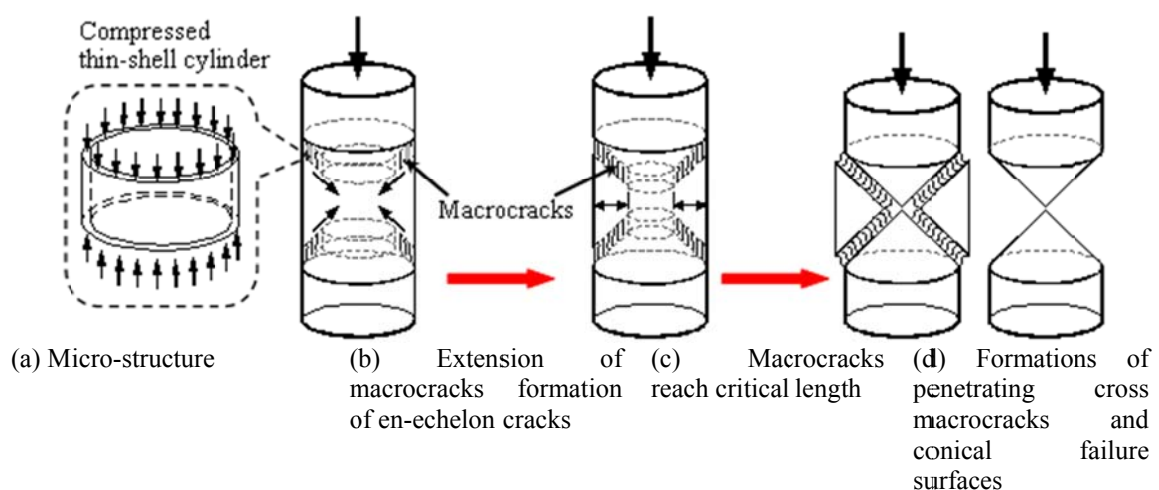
Failure mechanism of circular concrete columns subjected to central compressive load
